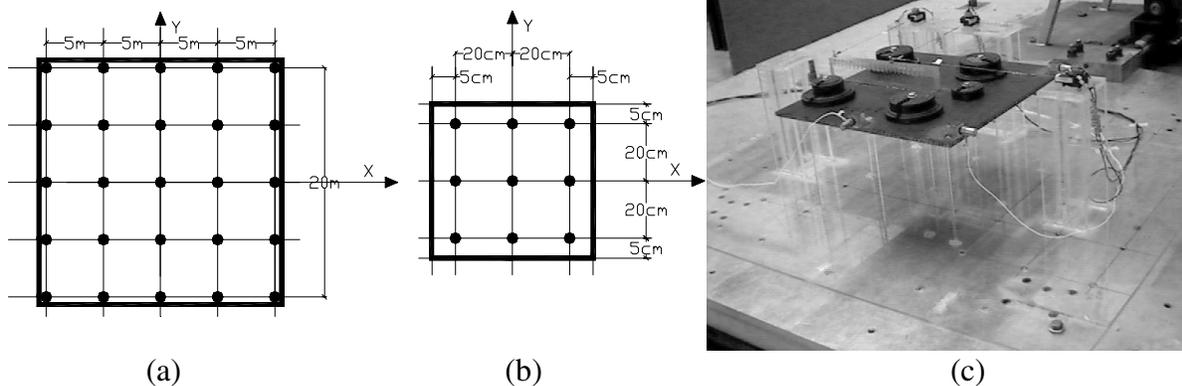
(a) Plan view of the prototype building. (b) Plan view of the model. (c) The reduced-scale model as built.
